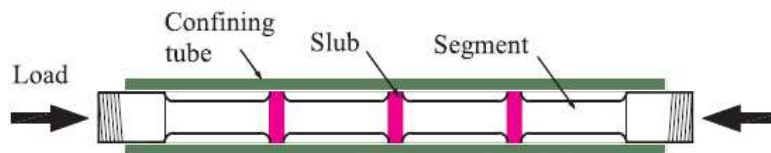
Buckling-restrained steel bars dampers at beam-to-column connection [1.11]
